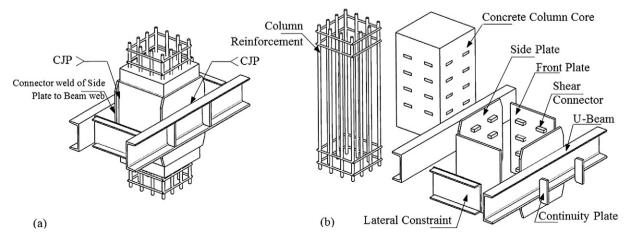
The first specimen (SPU): (a) Connection configuration, (b) connection assembly.
